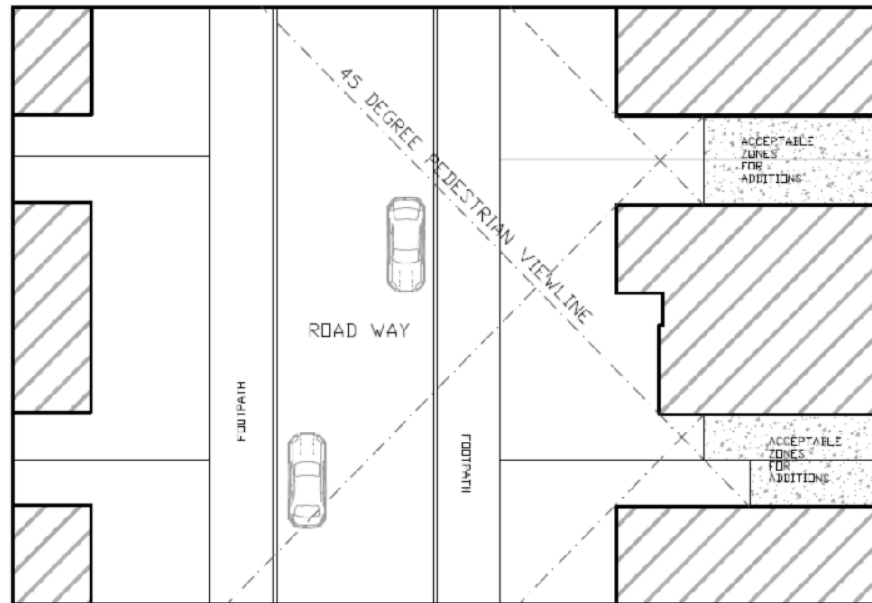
acceptable areas for ground level additions are sited within the area created by drawing a 45 degree view line from the opposite footpath through the front corner of the subject building and the corners of adjacent buildings.
